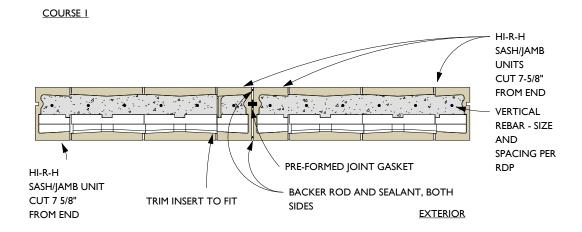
HI-R-H Horizontal Joint Reinforcement
